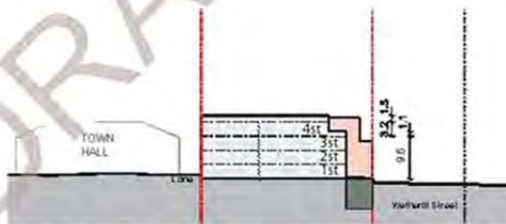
Wetherill Street - Building cross section (p. 194)
